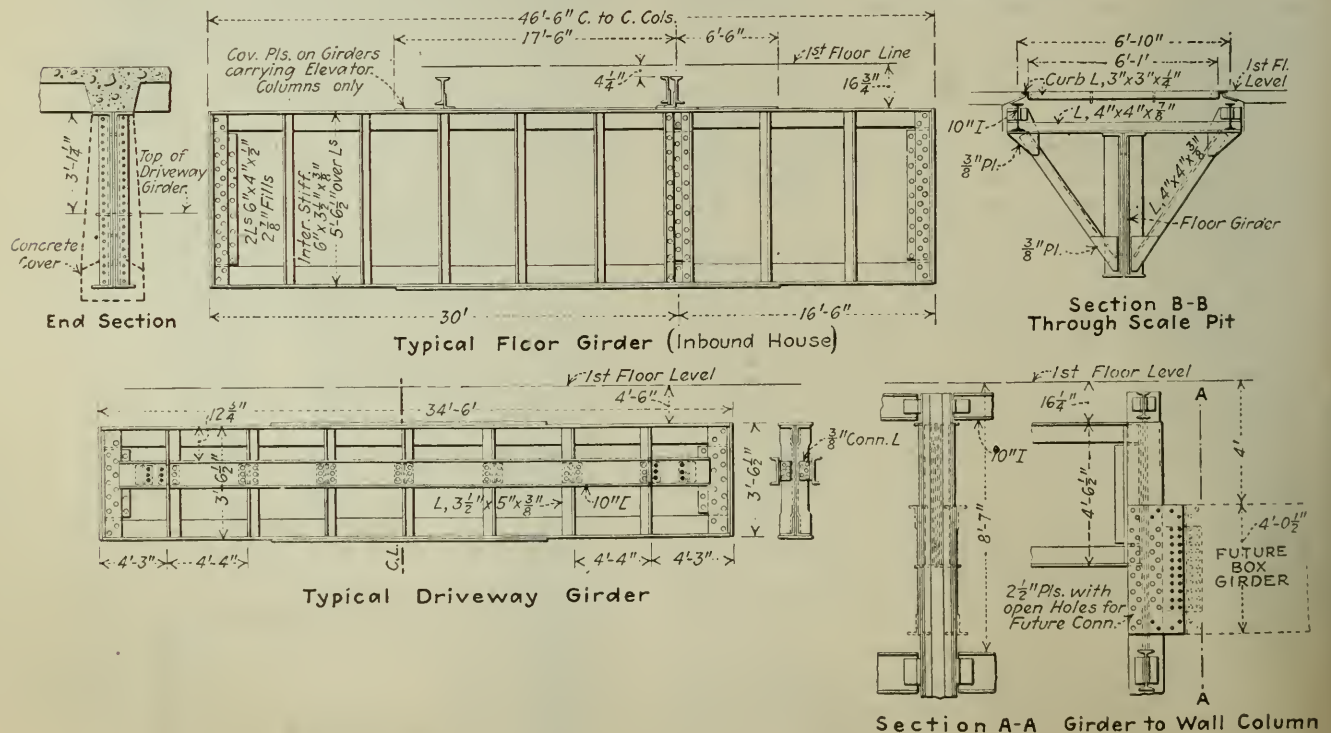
STEEL GIRDERS FOR FLOOR FRAMING
